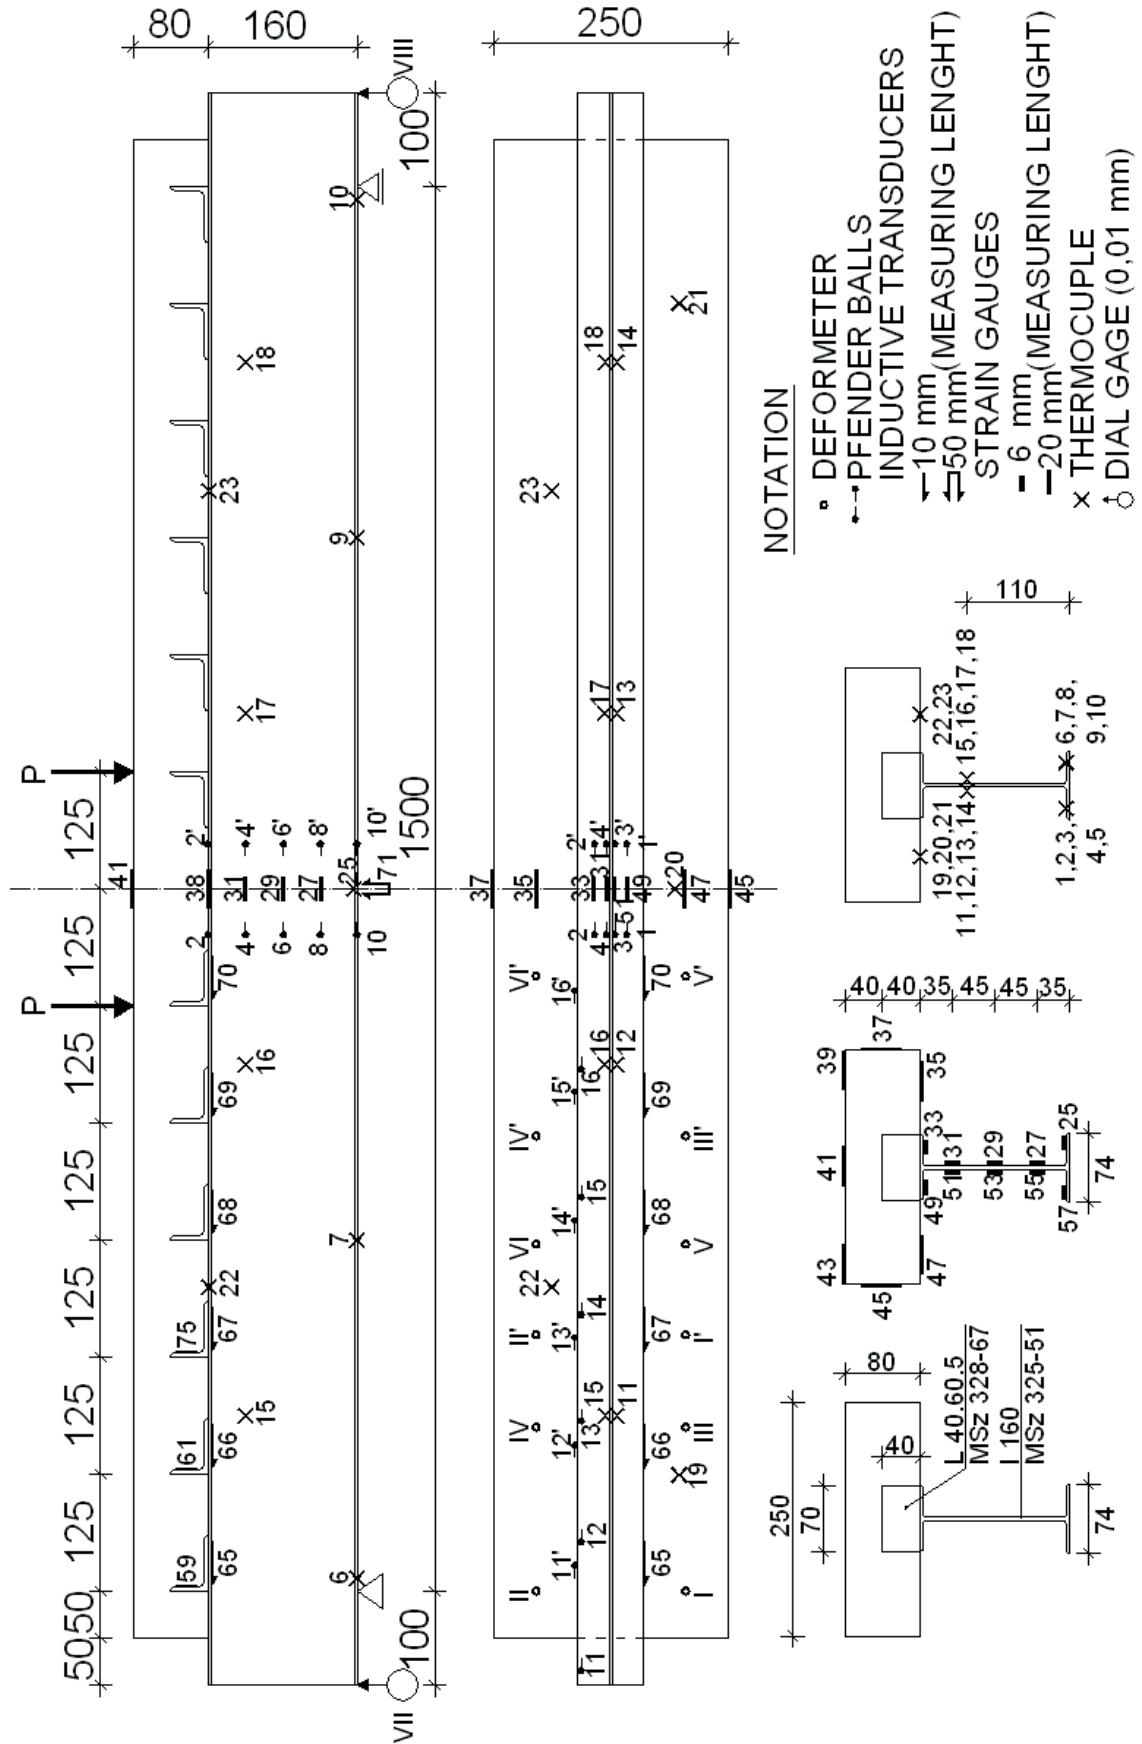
The dimensions, measuring points and instrumentation of Specimen S1. Measures in millimetres.
